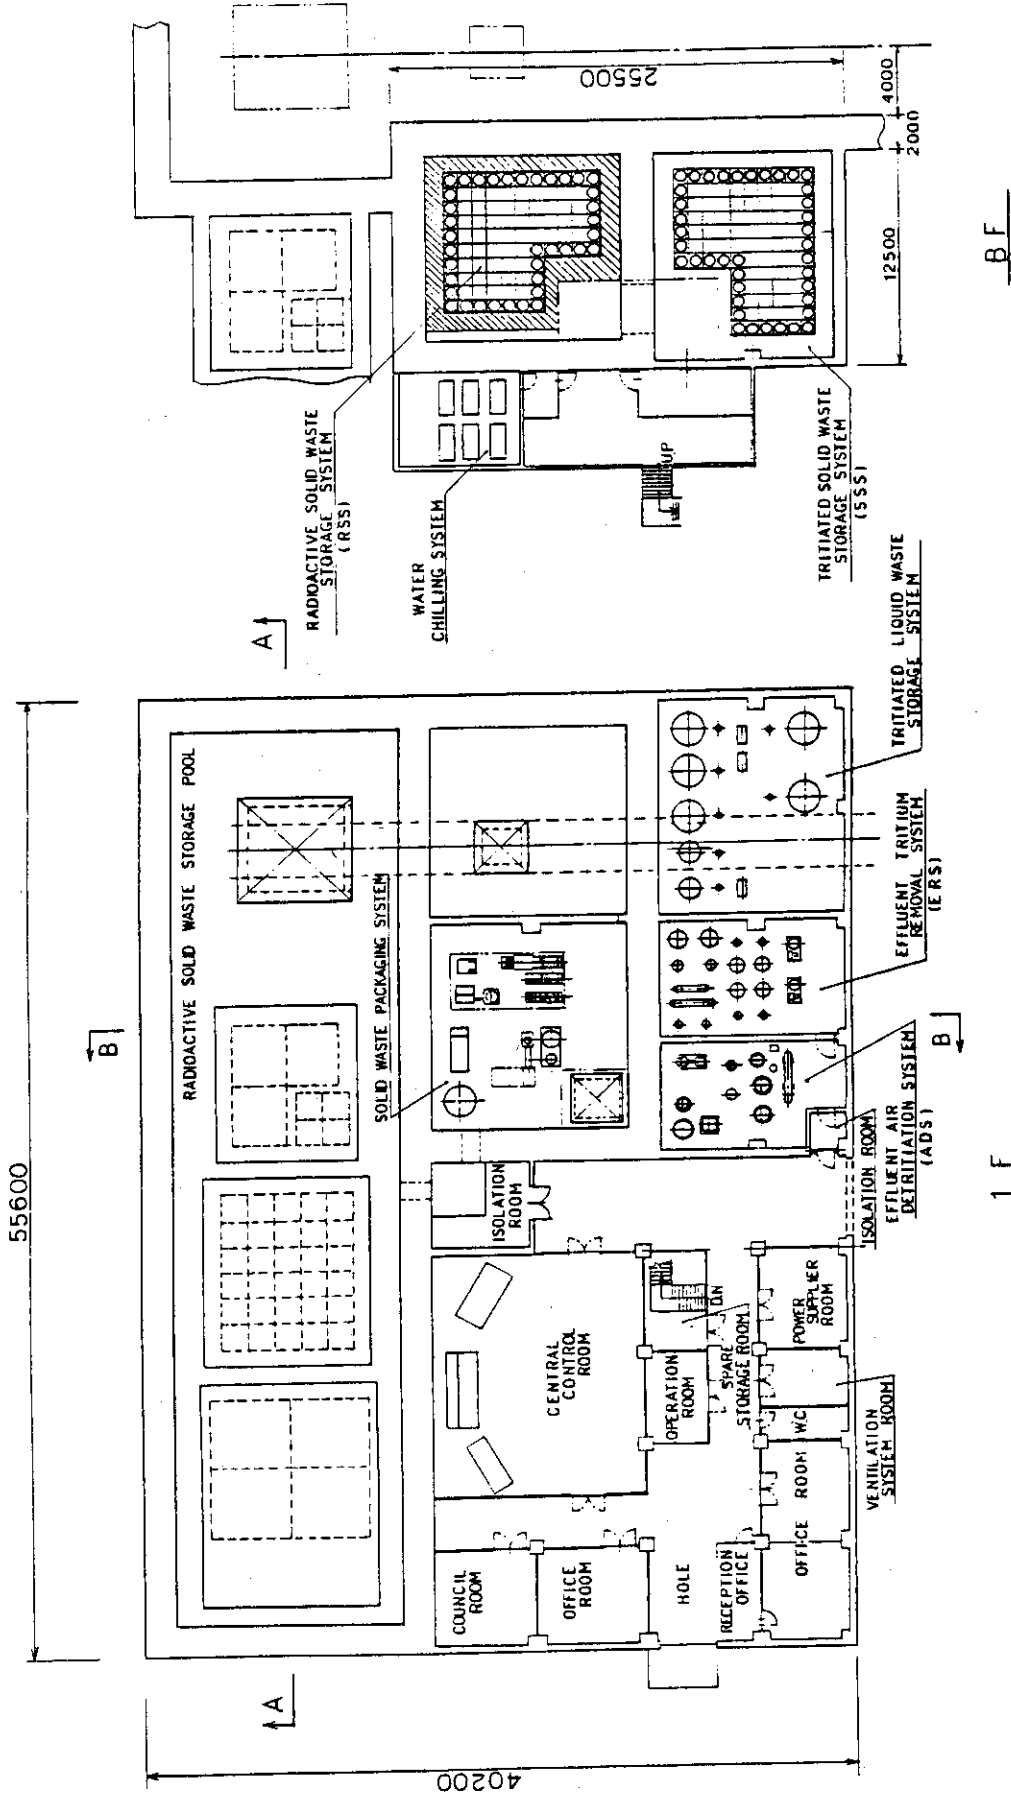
Rad-wastes treatment & storage building (Plan view)
